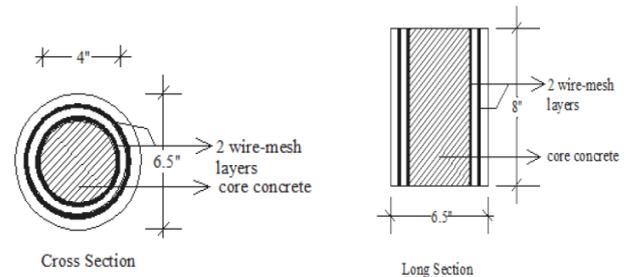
Detailing of the Section (Retrofitted by two layers of ferrocement overlay) [16].
